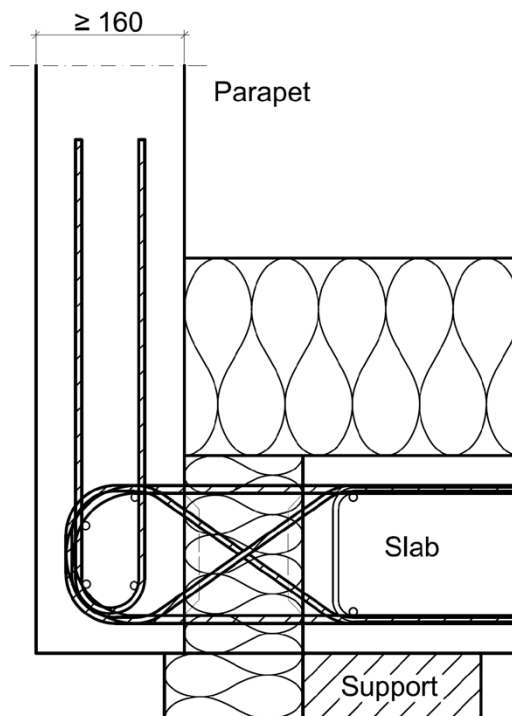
Example of Schöck Isokorb® Type F with SCE with on-site reinforcement
